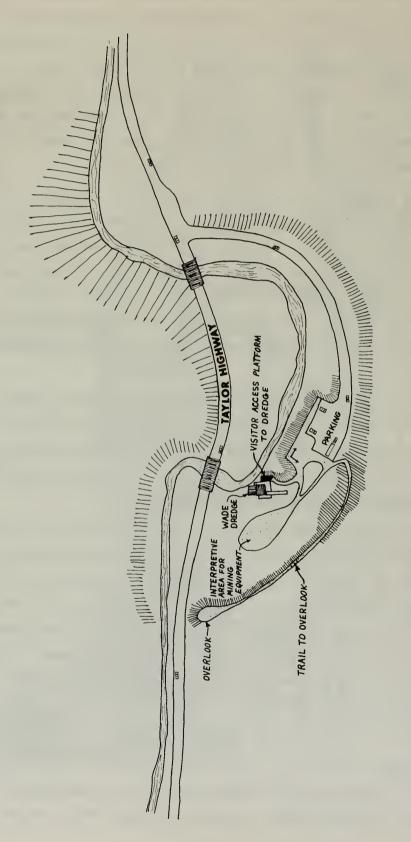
WADE DREDGE--DEVELOPMENT PLAN
